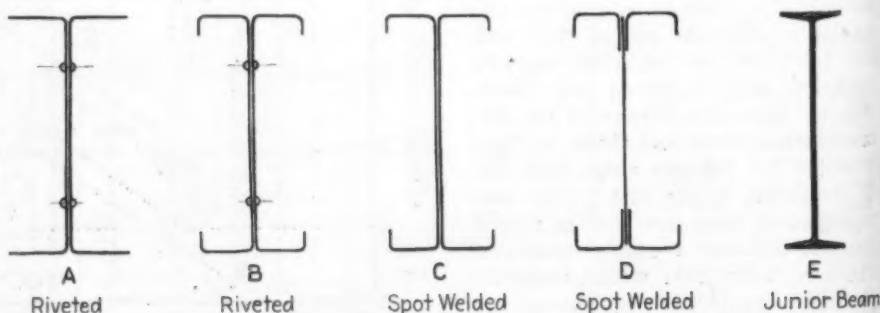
The forms of strip steel joists, leading up to the development of the junior rolled steel beam.
